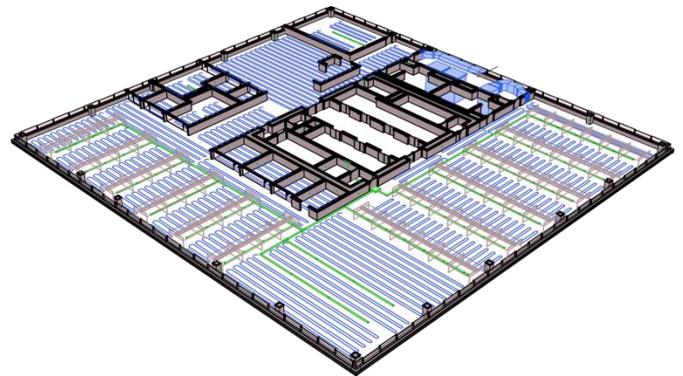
TYPICAL OFFICE LAYOUT: RADIANT VS CONDUIT
